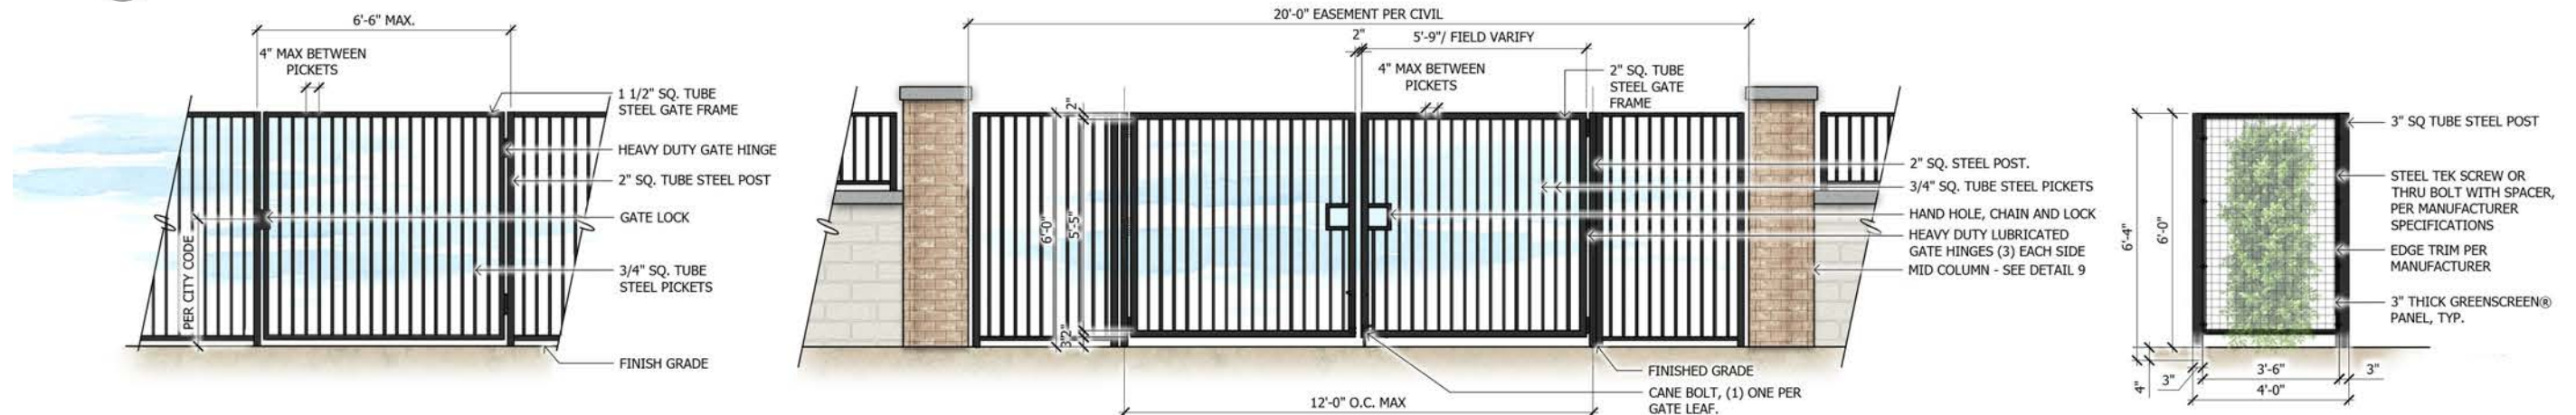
B: WALL, FENCE, AND GATE DETAILS
